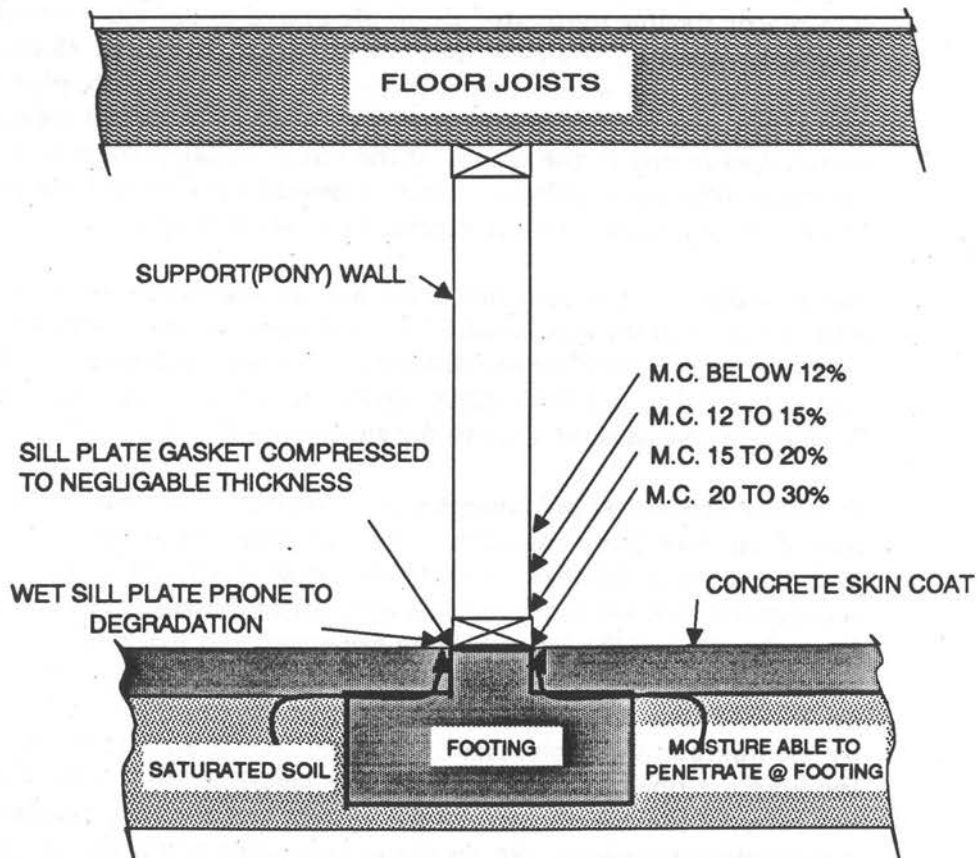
Typical Moisture Gradient for Slab Level Support Walls
